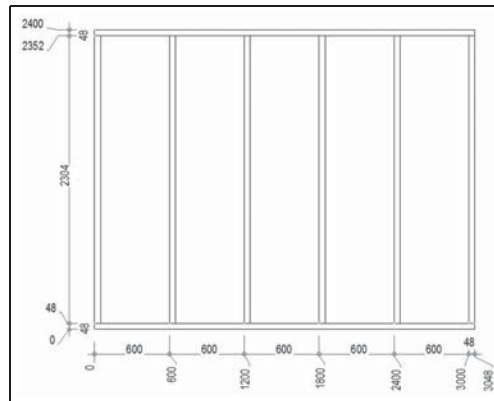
Cross section of the timber frame test section (dimensions in mm).
